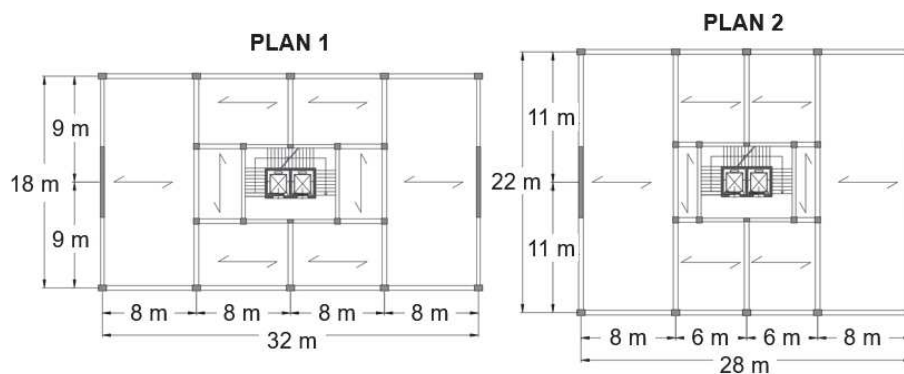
Plan view and dimensions of the benchmark building (*Plan 1*, left) and modified plan (*Plan 2*, right).
